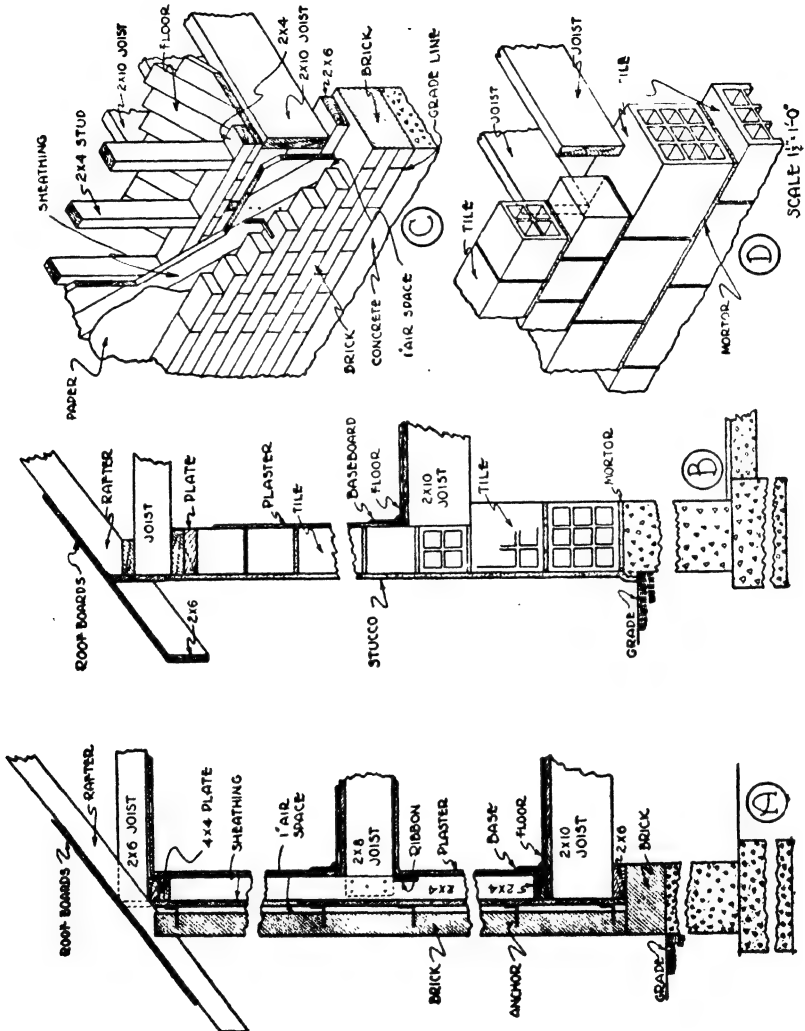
Wall Sections for Brick Veneer A and Hollow Tile B
